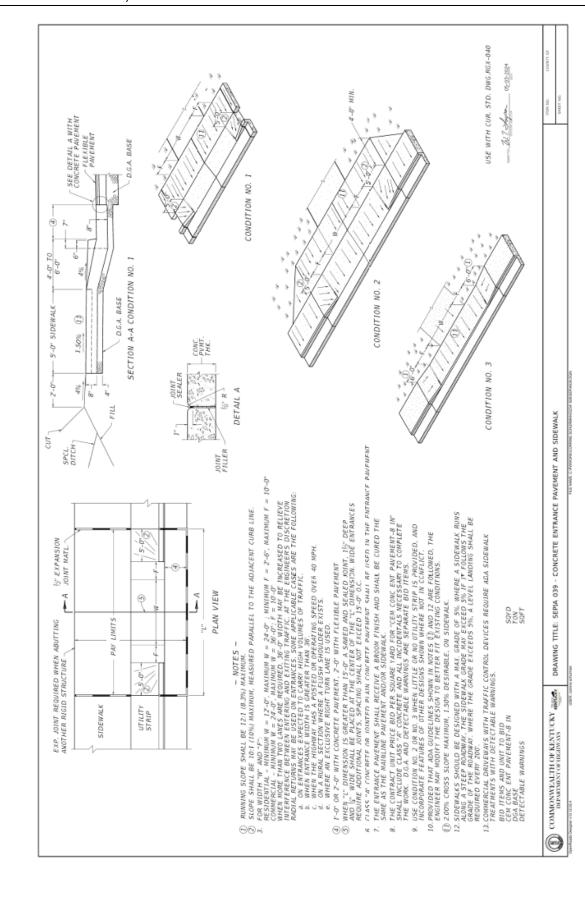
KYTC's Standard Drawing for Concrete Entrance Pavement and Sidewalk
